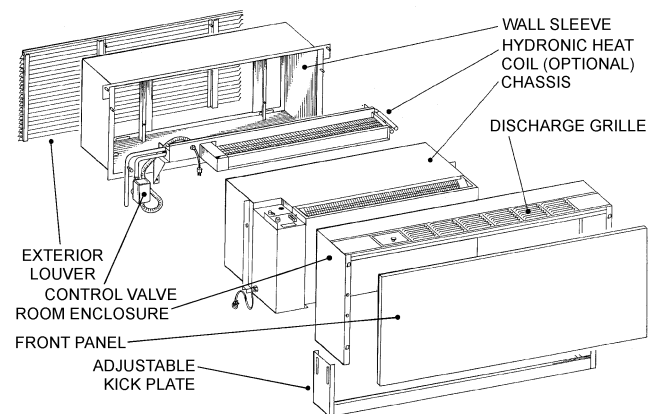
Packaged Terminal Air Conditioner with Heating Section Separate from Cooling Chassis
